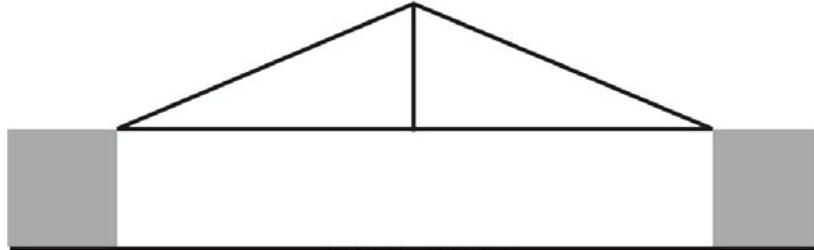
Philadelphia & Reading Railroad, Walnut Street Bridge (n.d.) spanning Reading main line at Walnut Street, Reading, Berks County, Pennsylvania. This bridge is an example of a single king post truss.
